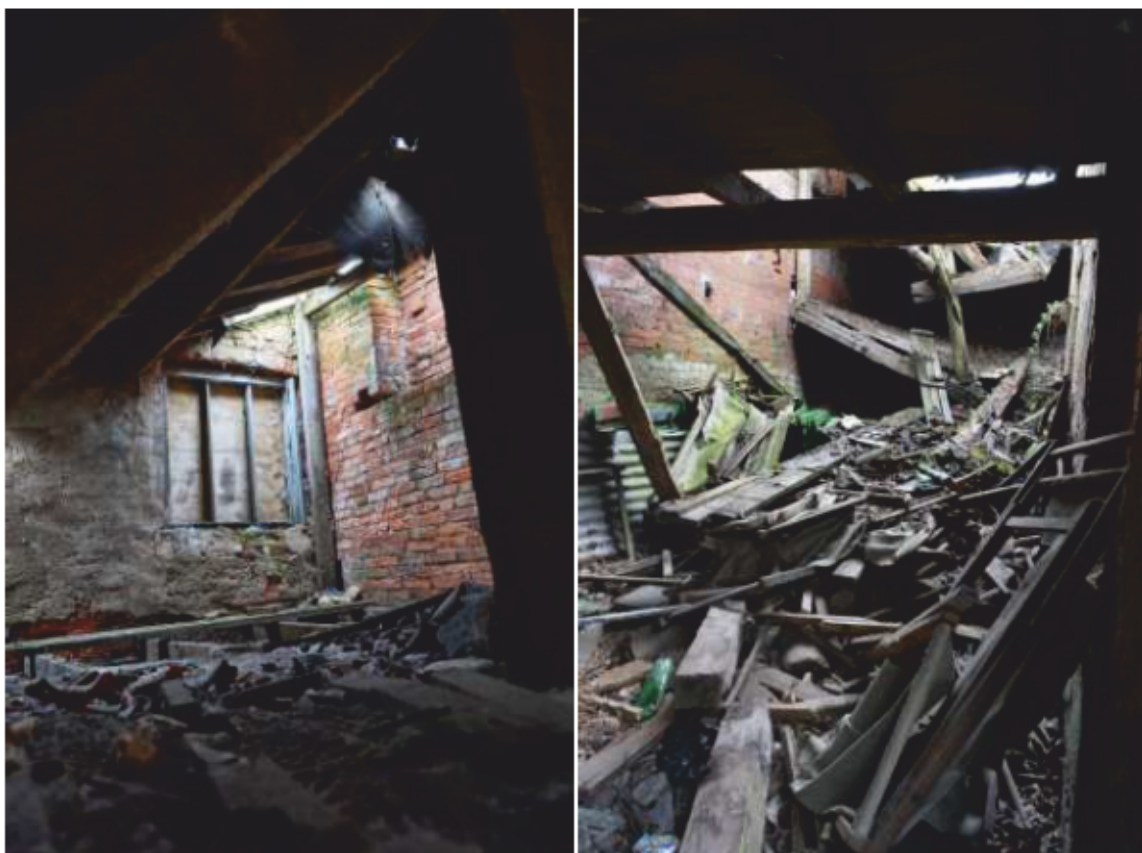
, left, and Plate 48, right: Wall face 18, interiors of Shed Phase 1, showing earlier blocked windows and collapsed roofing. Looking south-east and south-west.
